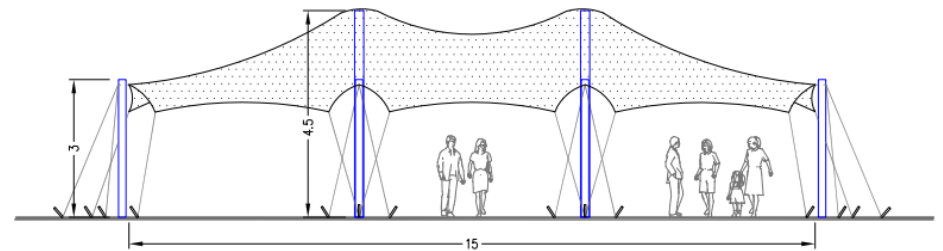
(above) - Proposed stretch tent elevations (not to scale - indicative only)
